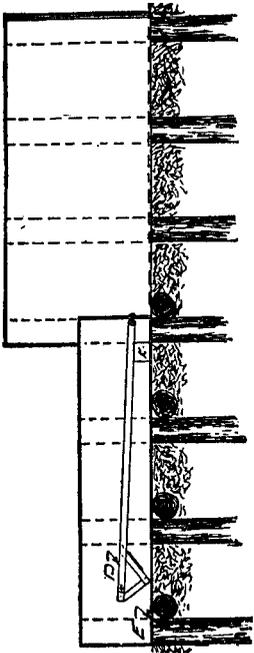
Side elevation of barricade shown in figures 2 and 3.
